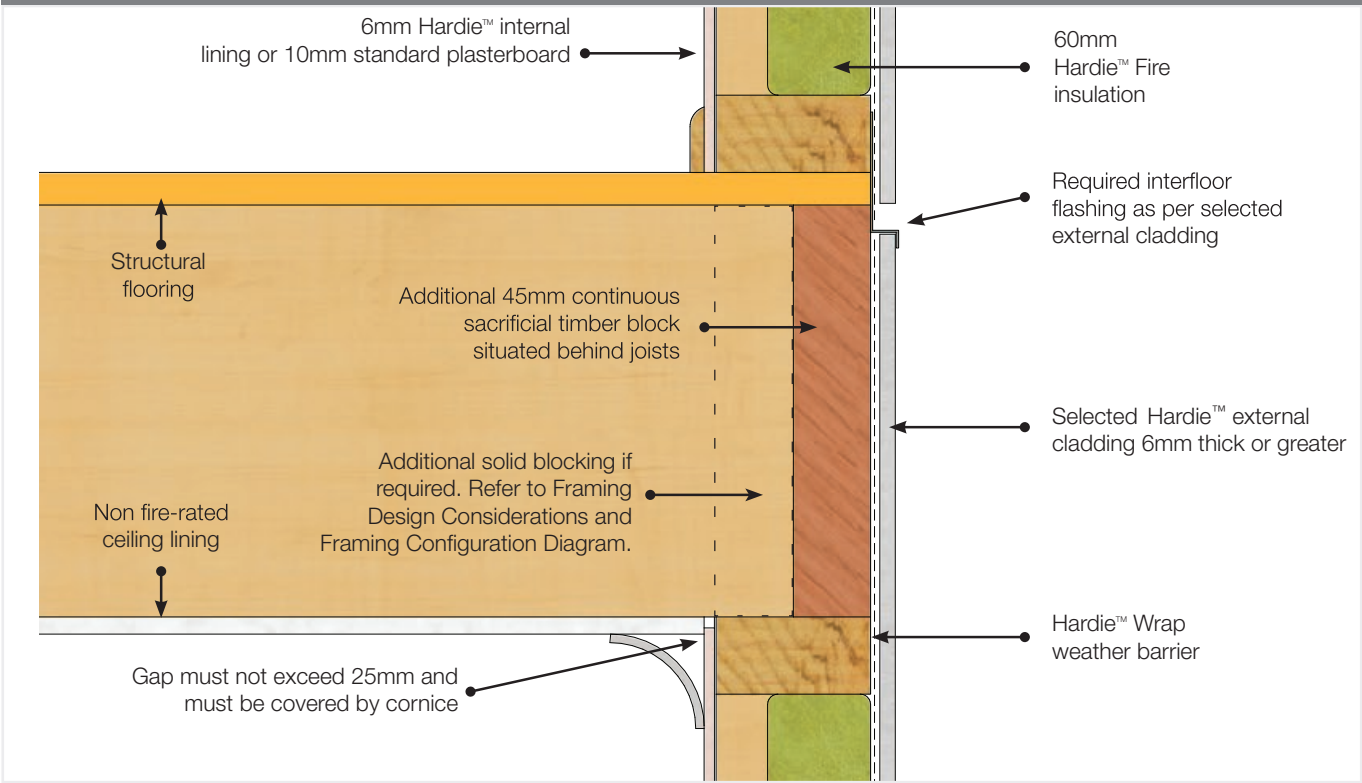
UPPER STOREY FLOOR JUNCTION OPTION 1
